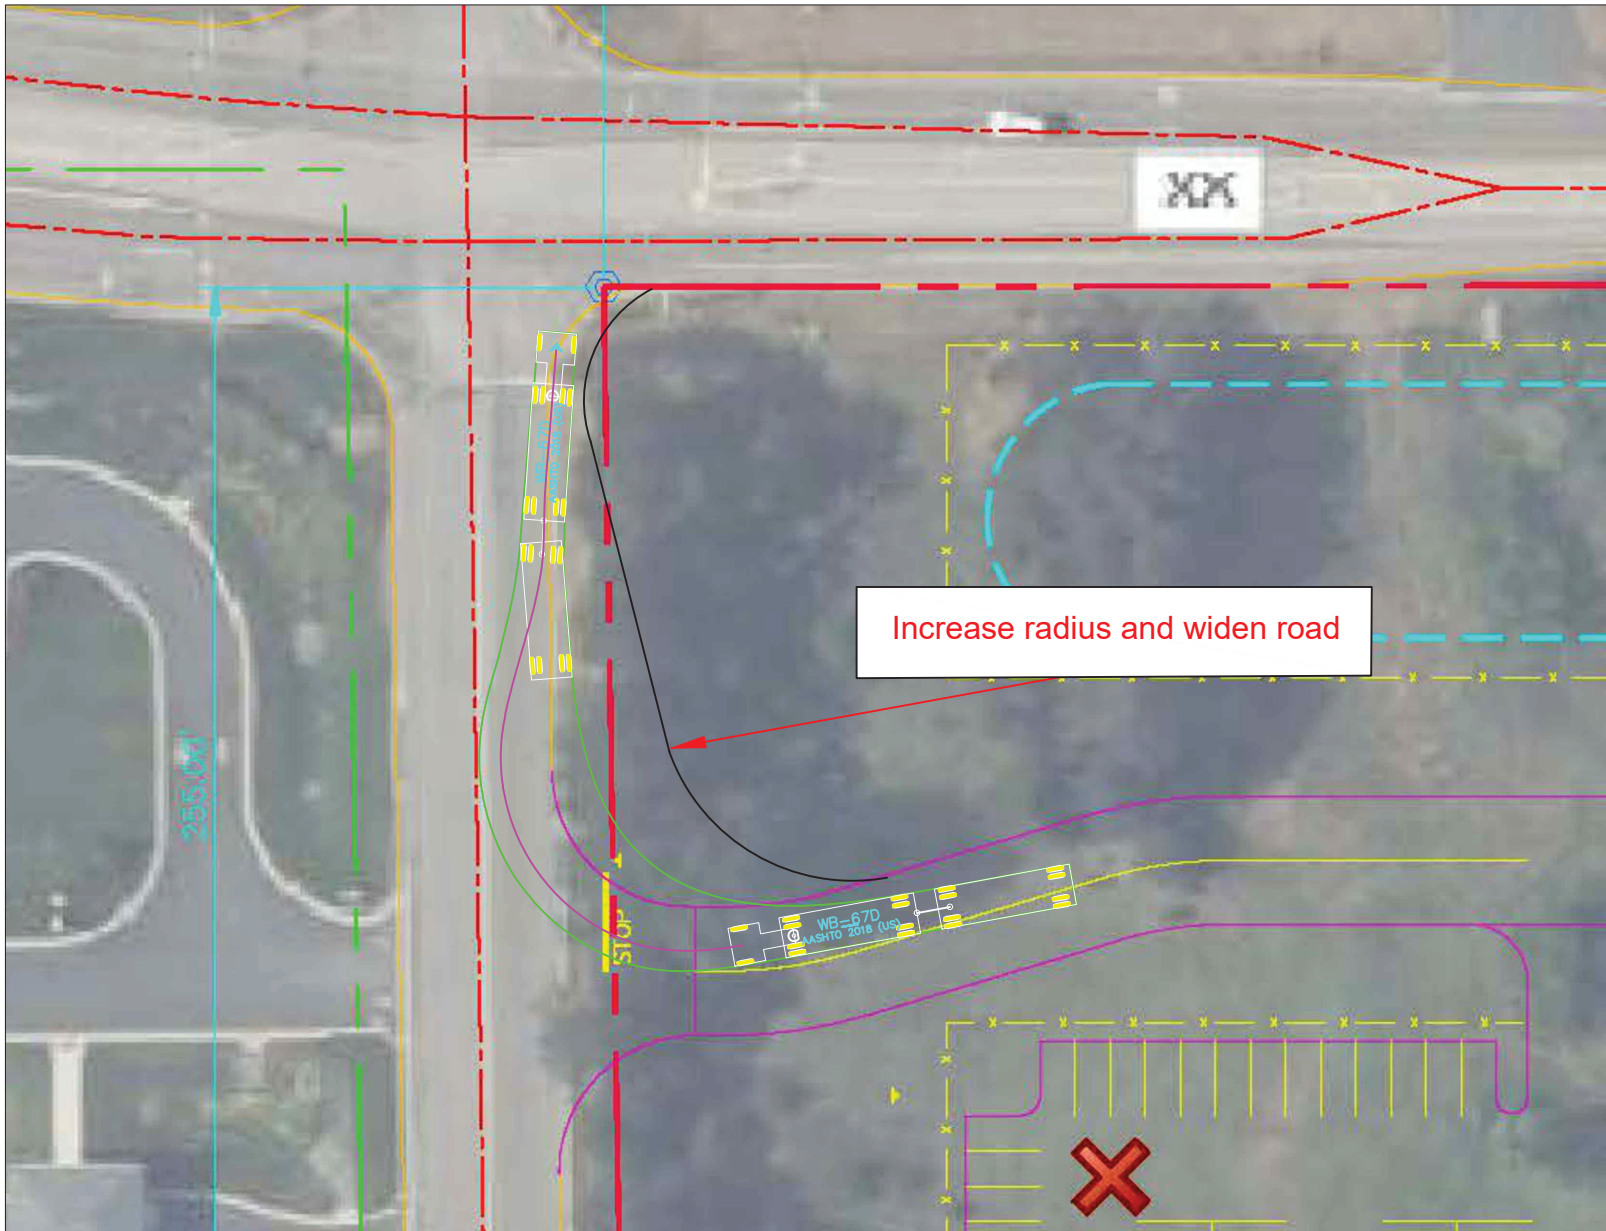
TRAILWOOD AT NORTH DRIVEWAY
